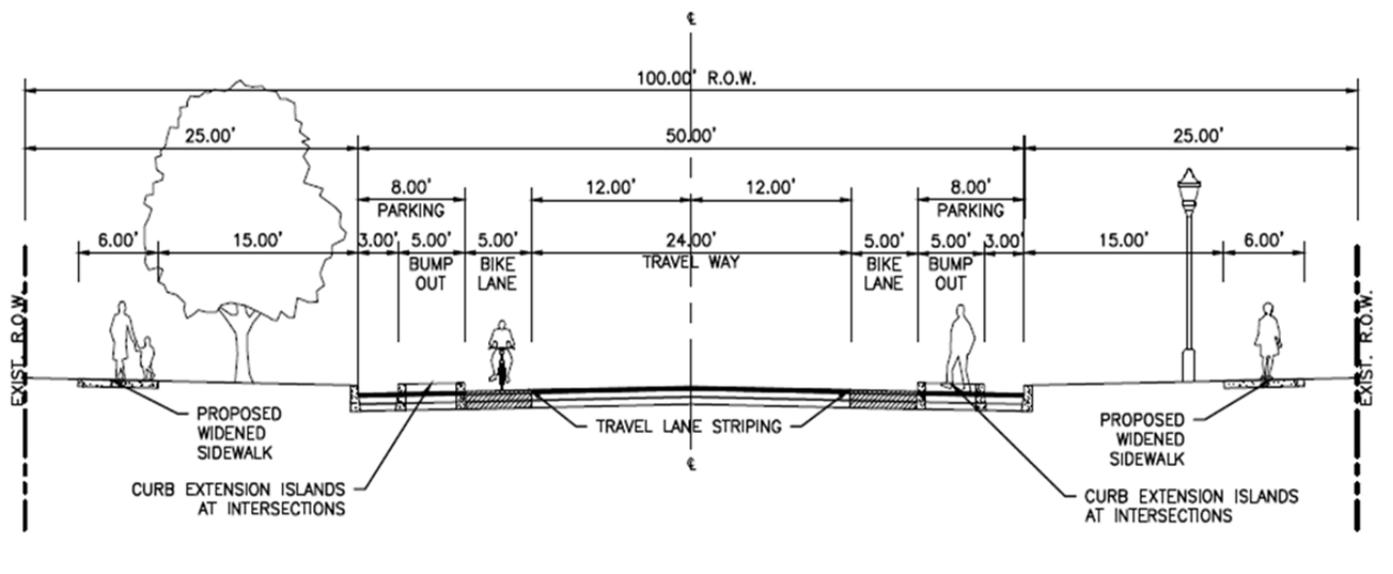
TYPICAL CROSS SECTION FOR MANTUA AVENUE
